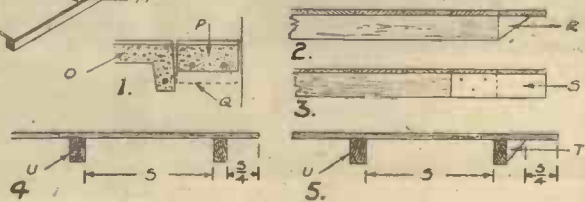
Methods of making-up standard dimensioned units with fillers.
